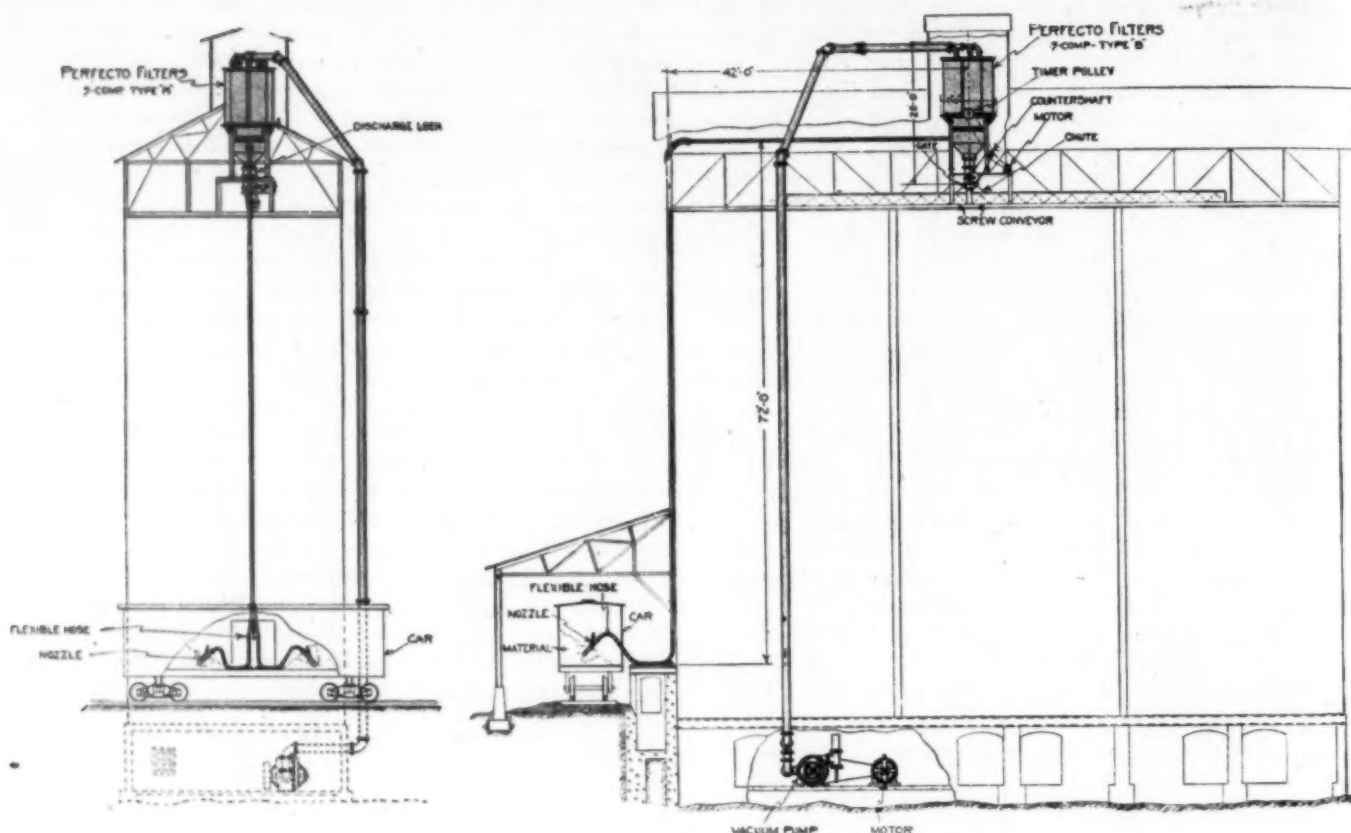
BAUXITE-HANDLING SYSTEM LAYOUT
